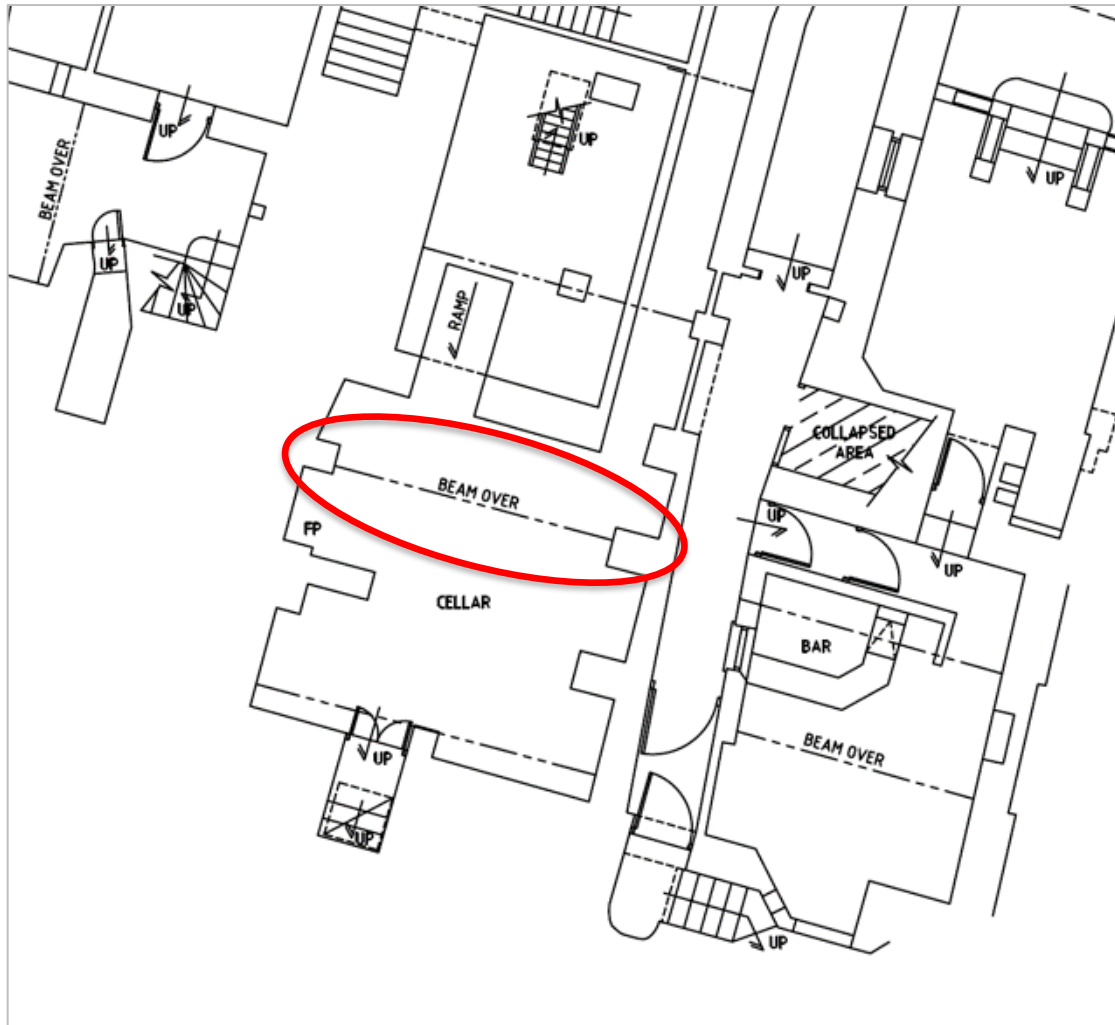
Extract from a plan of the basement area of No. 5 Castle Terrace, showing the location of a former beam between wall projections (plan supplied by Pembrokeshire County Council).
